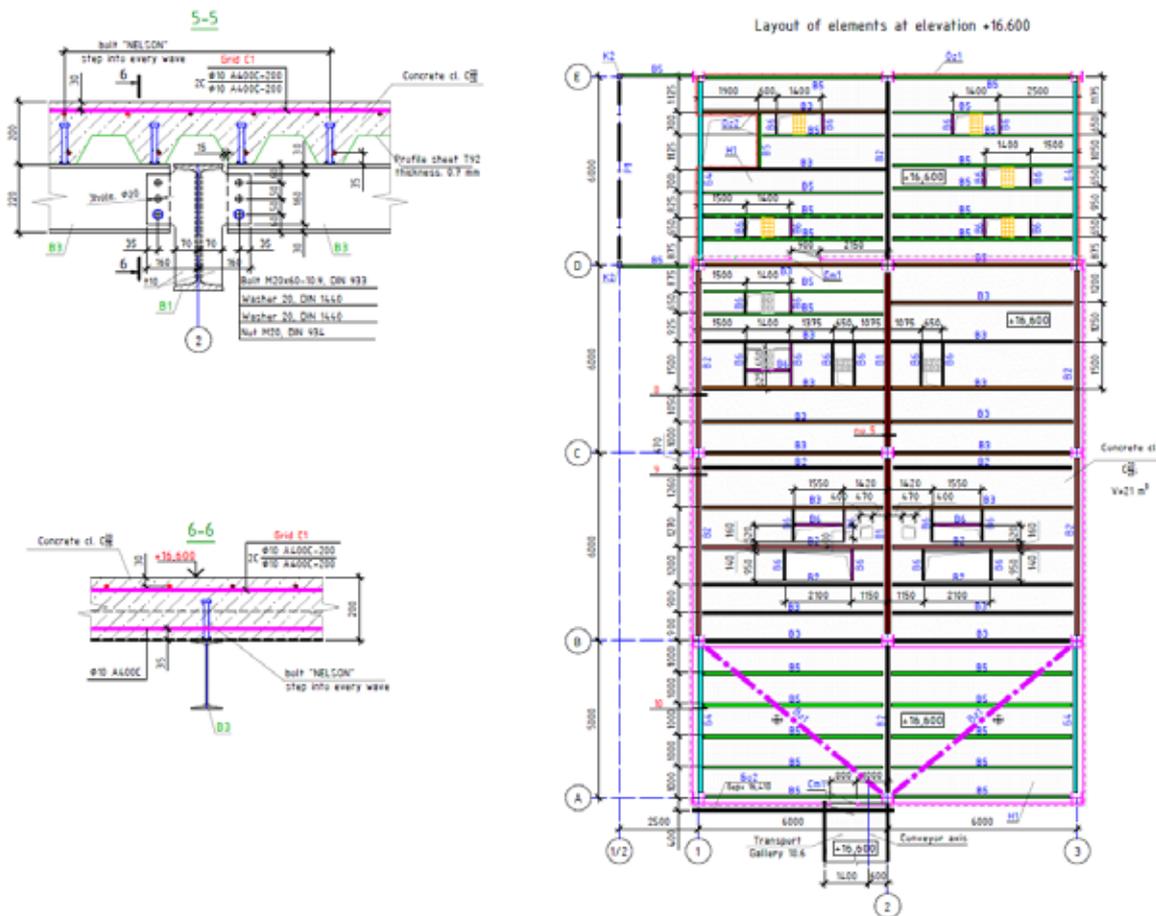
Connection details and plan layout of the separator floor at elevation +16.600 m
